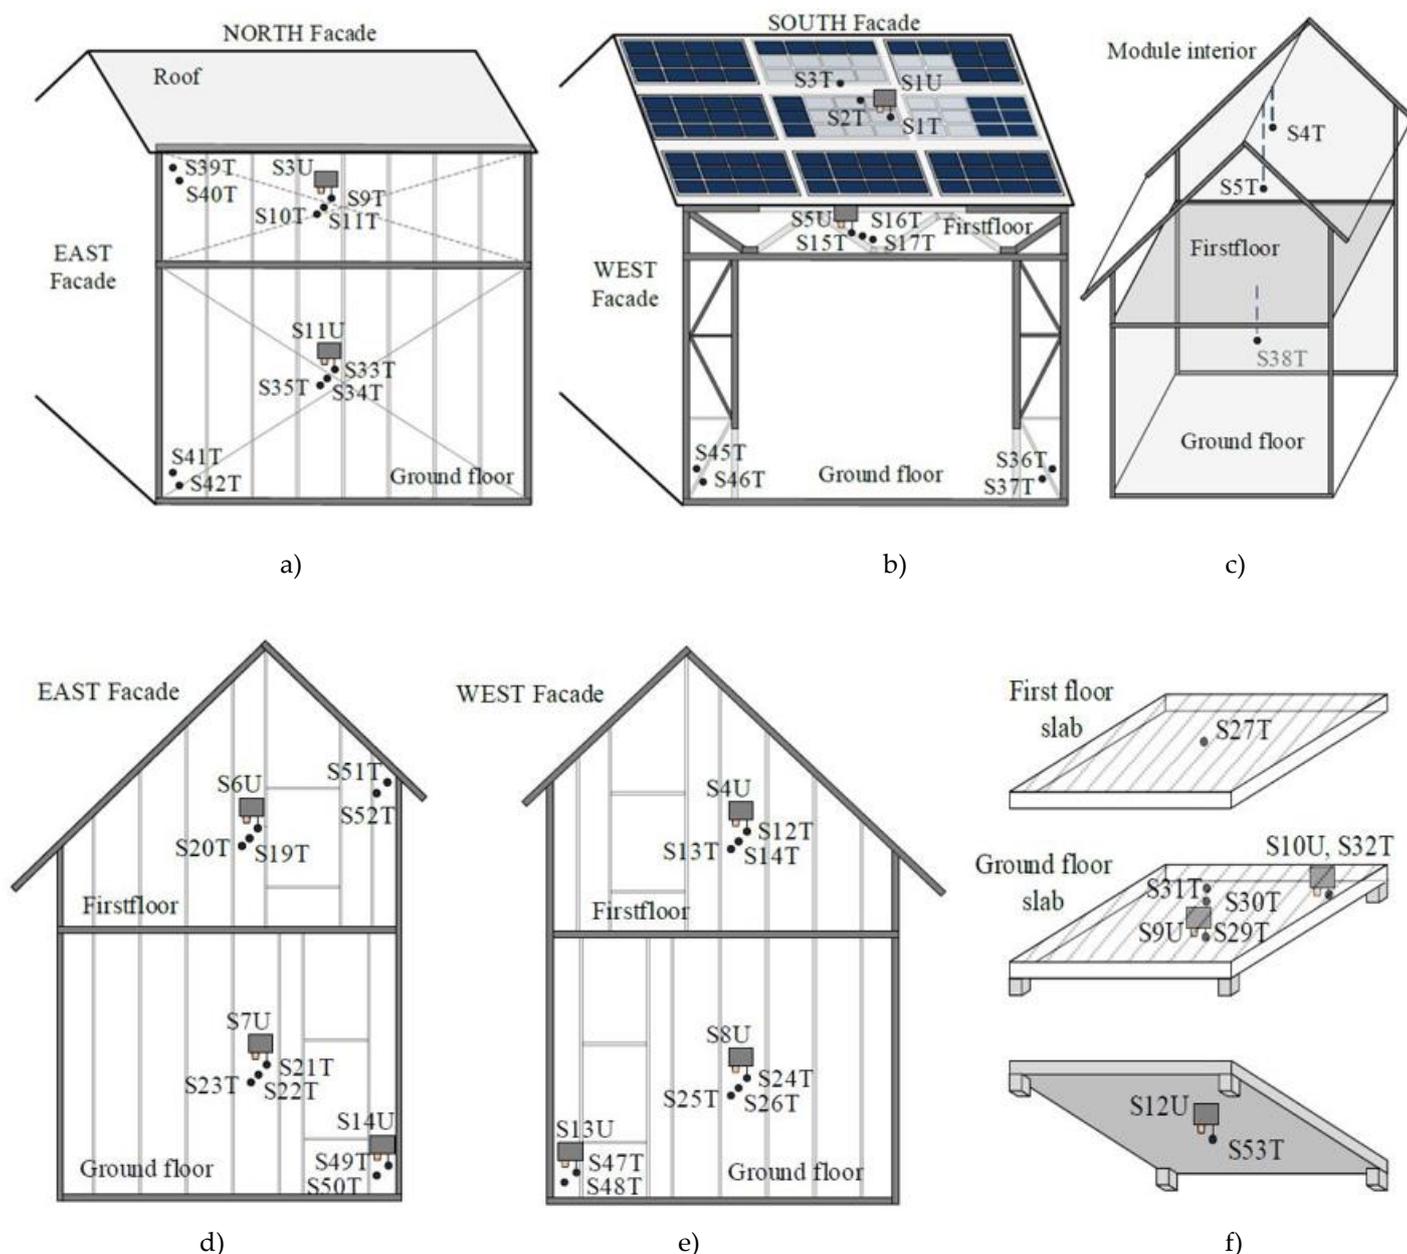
Sensors' distribution on LSF experimental module: a) North Façade b) Southern Façade and Roof c) Interior d) East Façade e) West Façade f) in slabs (adapted from [9]).
